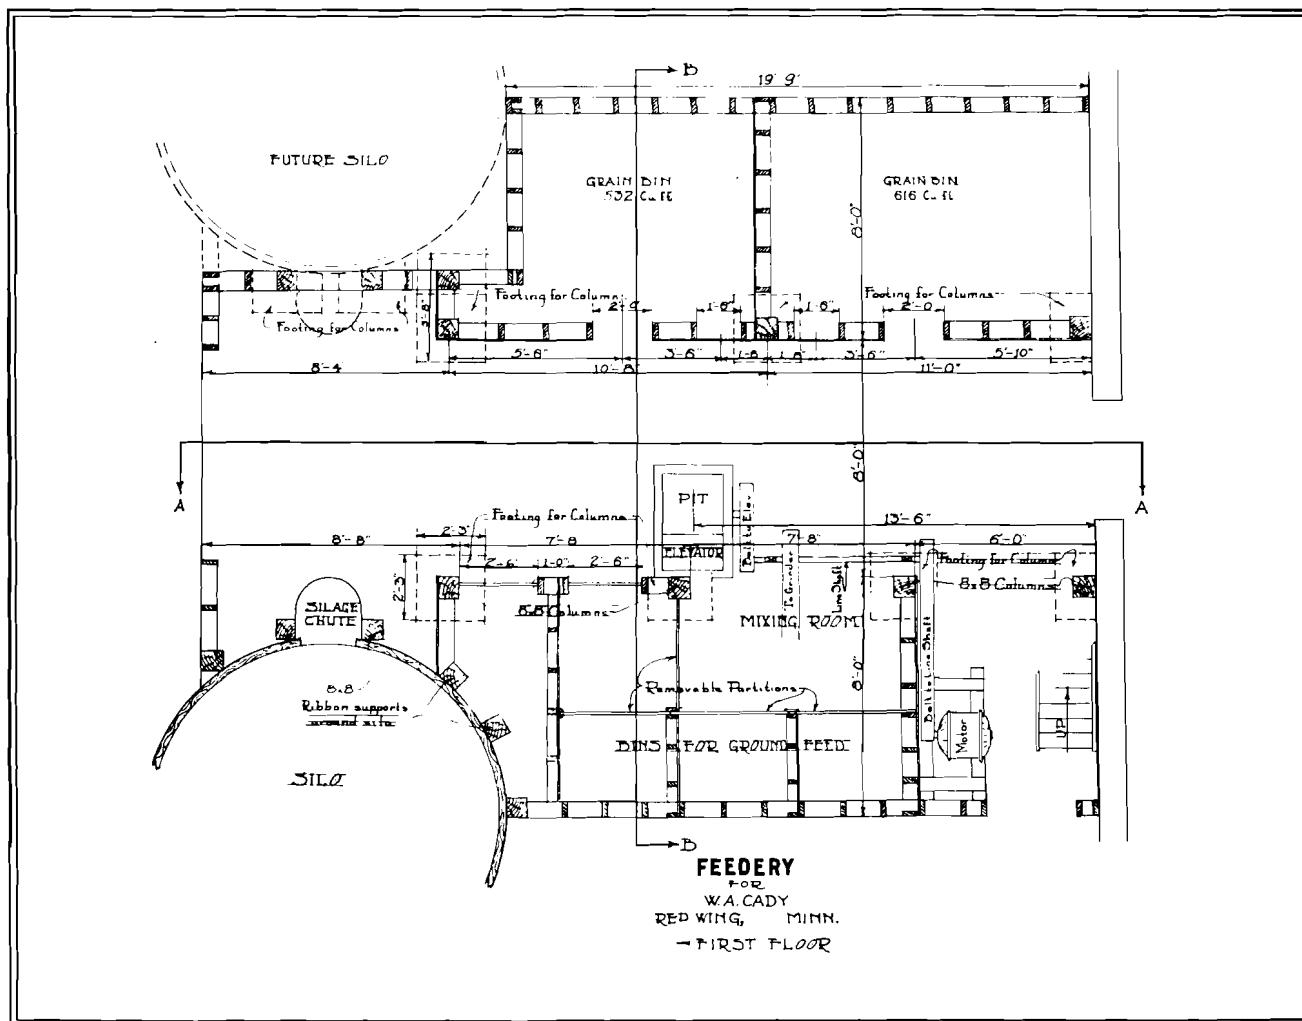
First floor plan of feedery at the Cady farm. Note location of motor, line shaft, and elevator.
